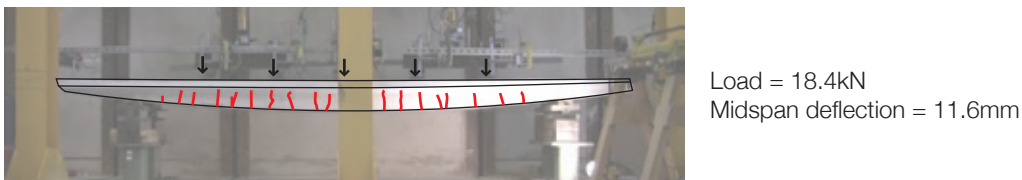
Cracking in Beam 6\_4\_2 at 60% of its design load.
